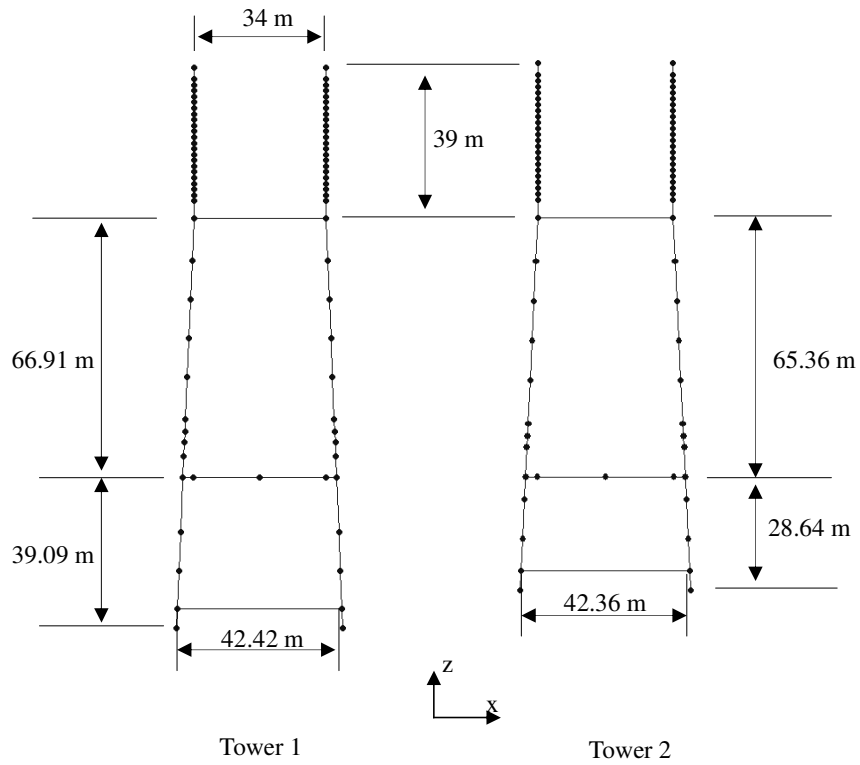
Towers models of the Kap Shui Mun Bridge
